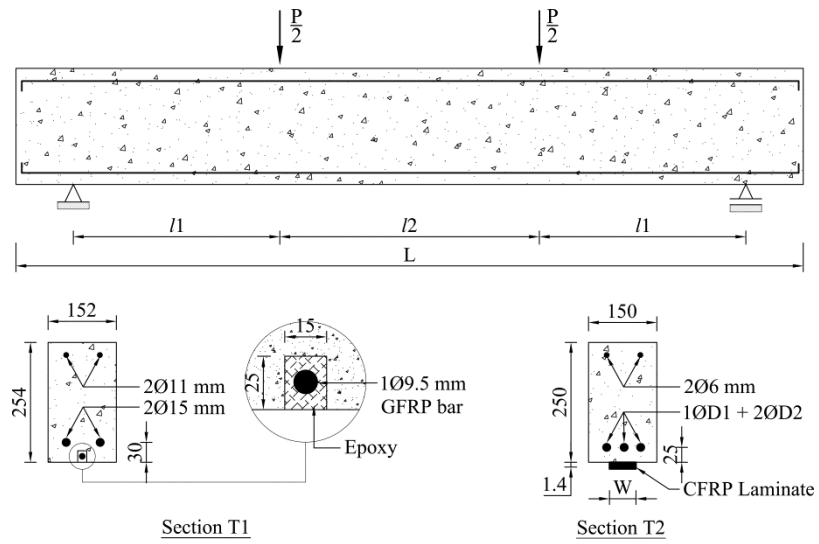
Geometry of the beams, reinforcement and strengthening configurations (dimensions in mm)
